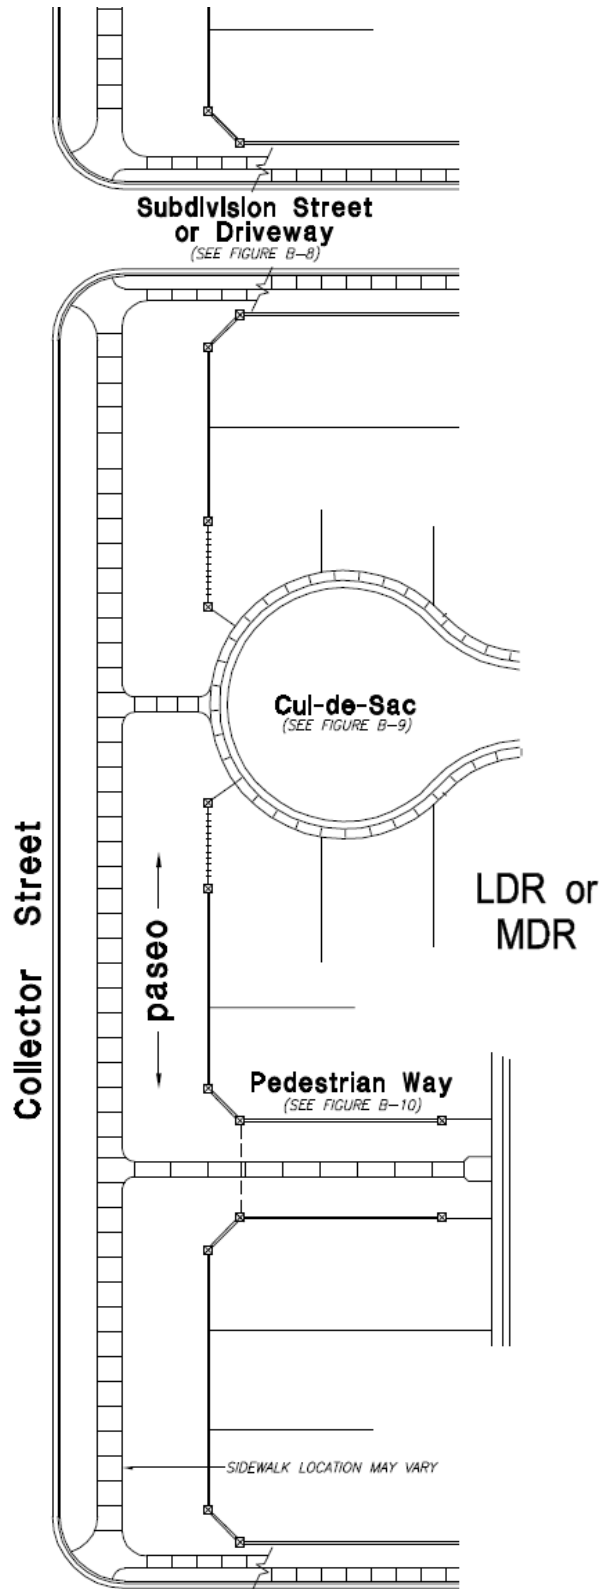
Collector Street Paseo Pedestrian Connection Points
